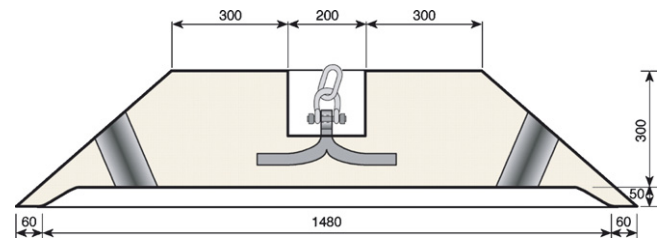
Vertical cross-section of the concrete frustum shaped benchmarks used at Sleipner to provide platforms for time-lapse gravity measurements. Dimensions are given in millimeters.
